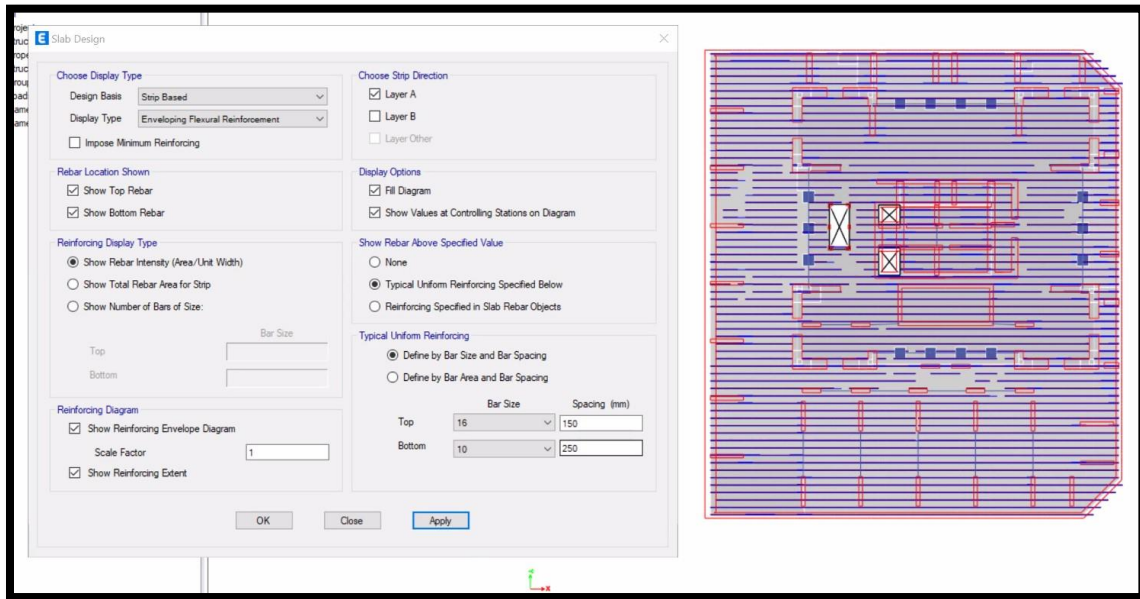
Top Reinforcement in X-Direction for Ground Floor
